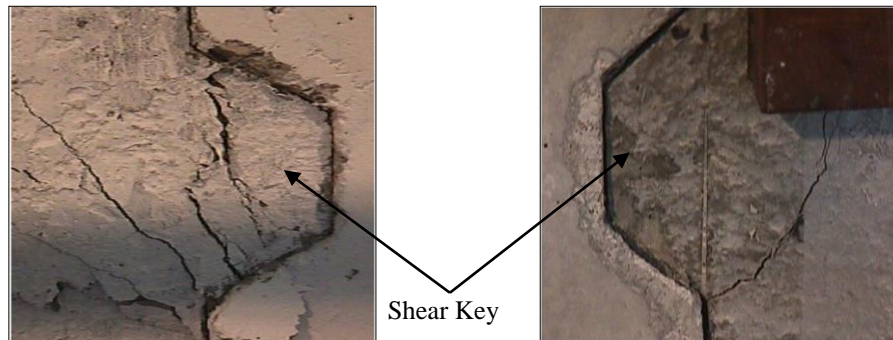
Crack Patterns of Shear Keys (Reported by Turmo et. al.)⁽⁵⁾
